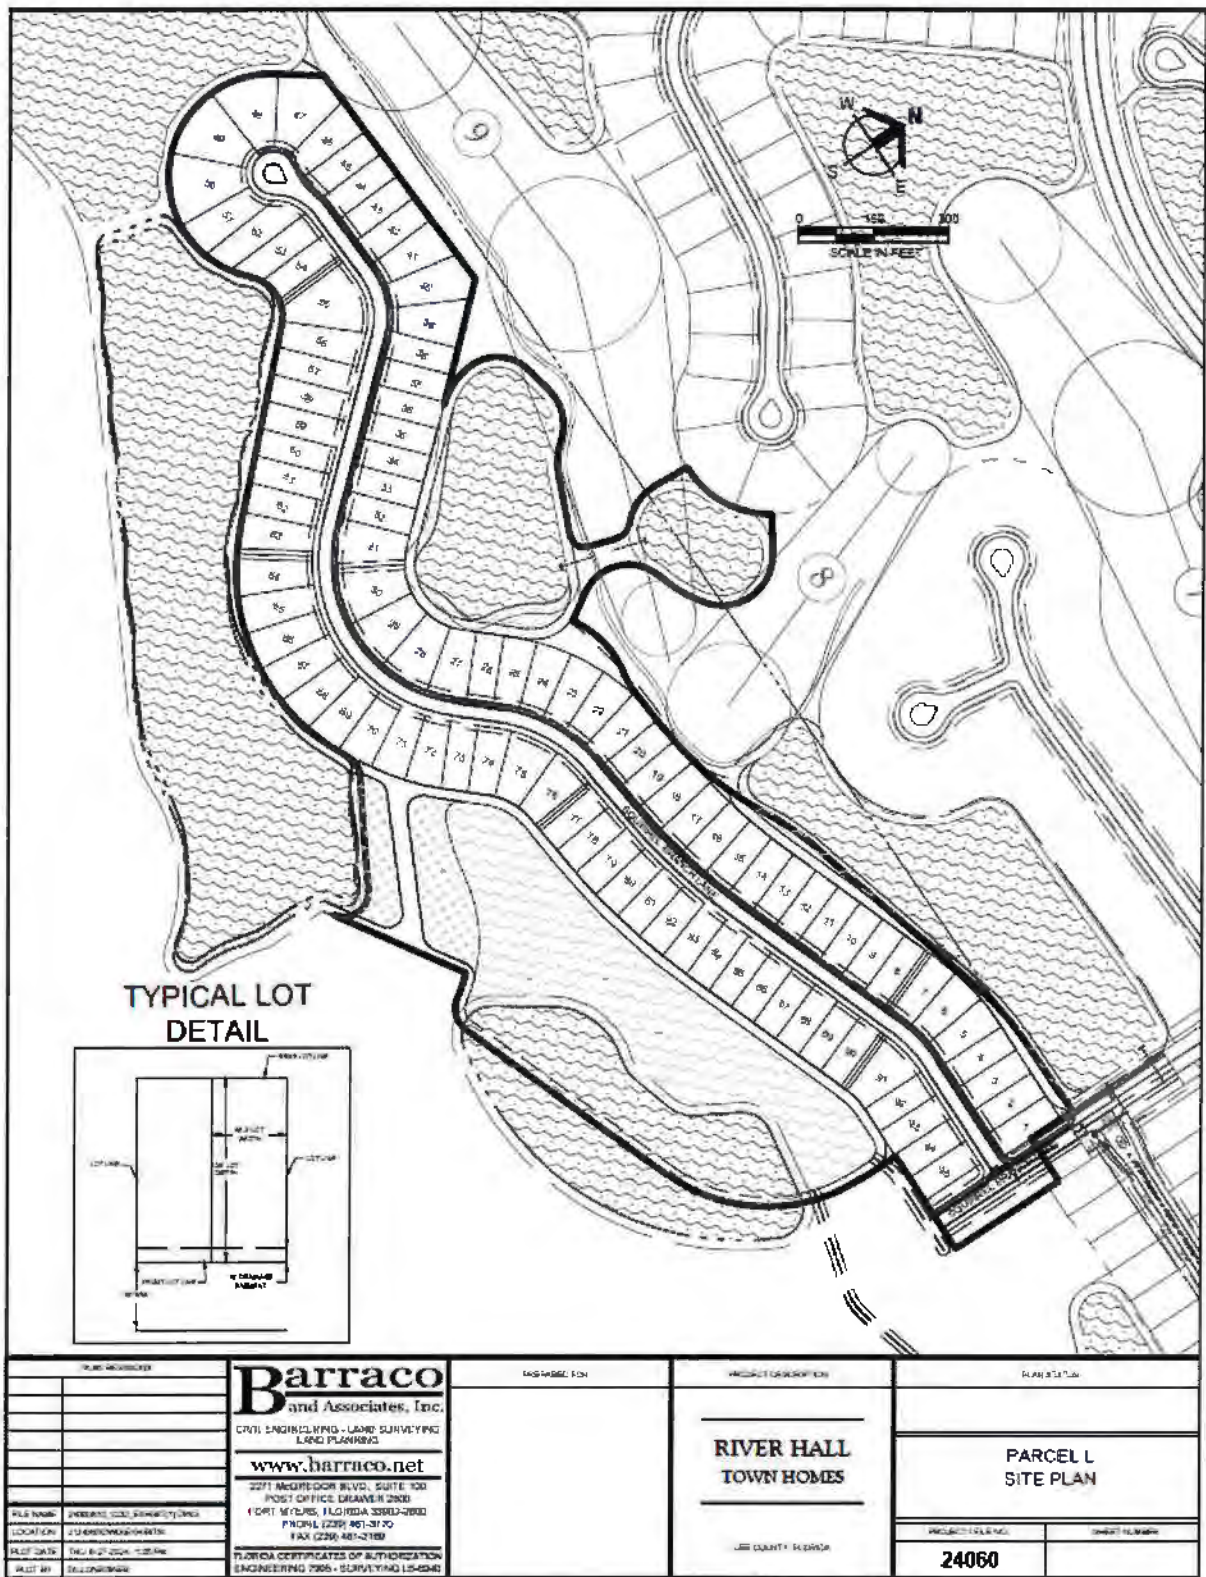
Exhibit C. Parcel L Site Plan (with Typical Lot Detail)
